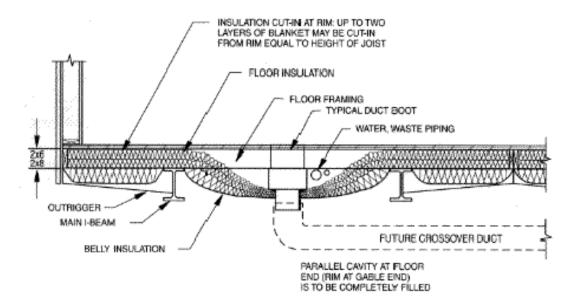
Floor and belly area with supply ducts. These ducts supply conditioned air to all rooms through floor vents, a common duct system layout in manufactured homes.
